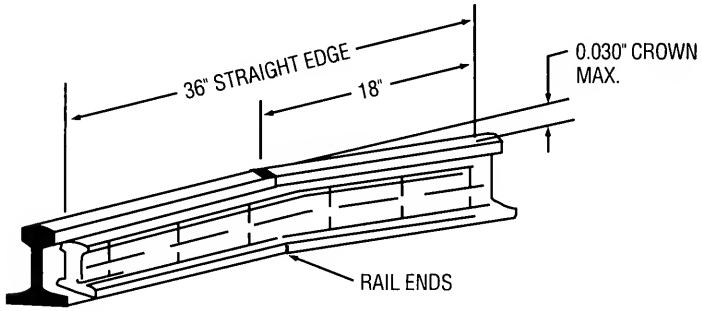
Elevation of Joint Showing Misalignment Tolerance in Vertical Alignment per Section 6.2.
